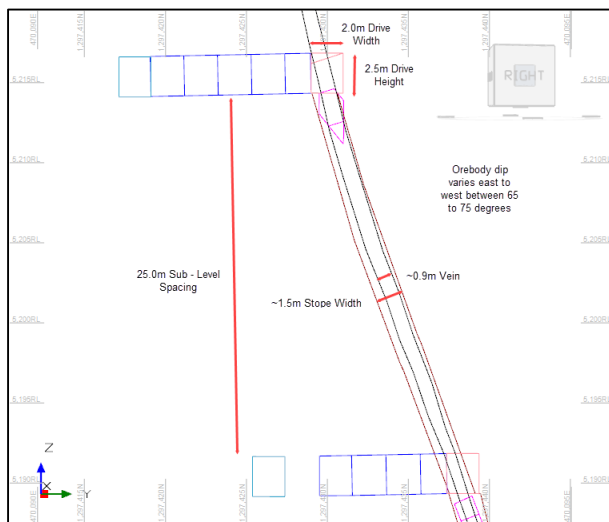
Typical Cross Section Bagassi South QV' – Stoping Layout and Mineralization
